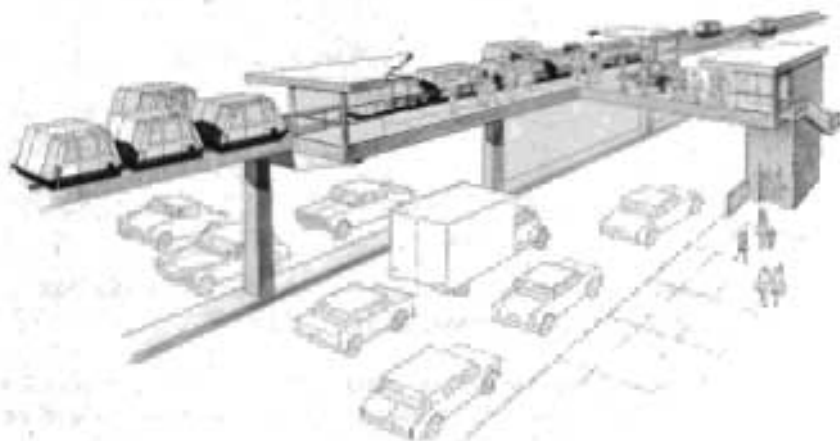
Activity-Center Station Installed Over Center of Street
